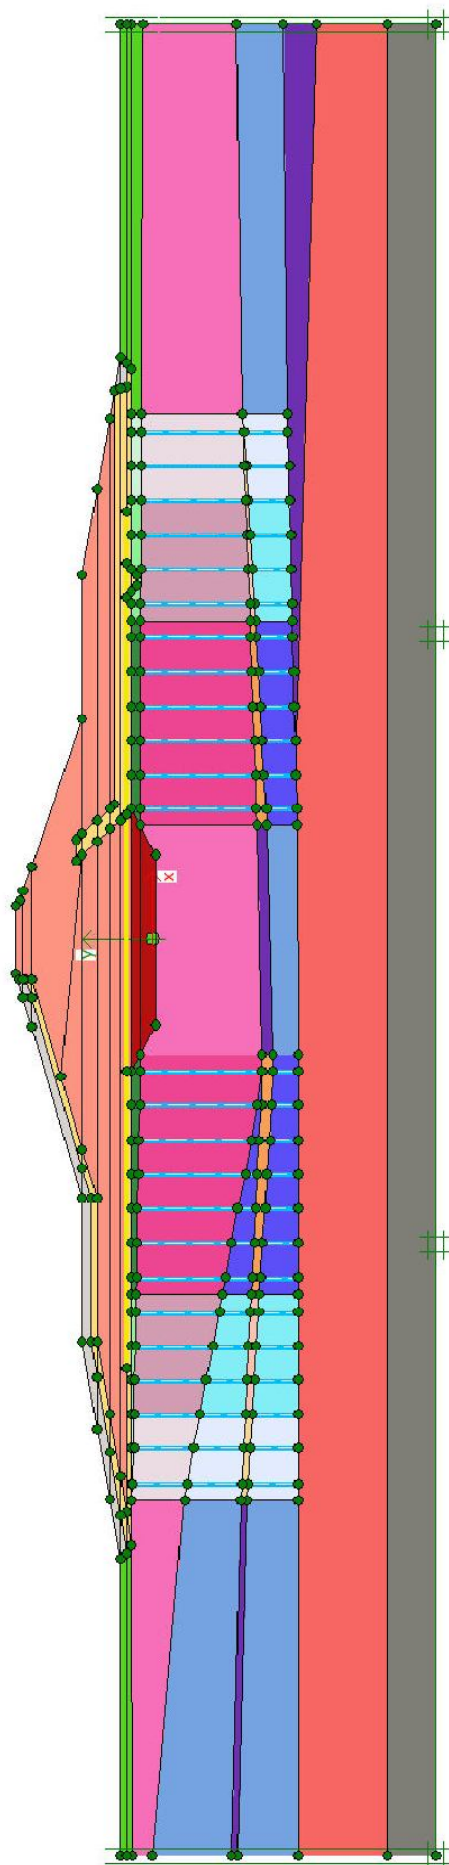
Conclusion of embankment construction - PK0+240 of Dike No.1
